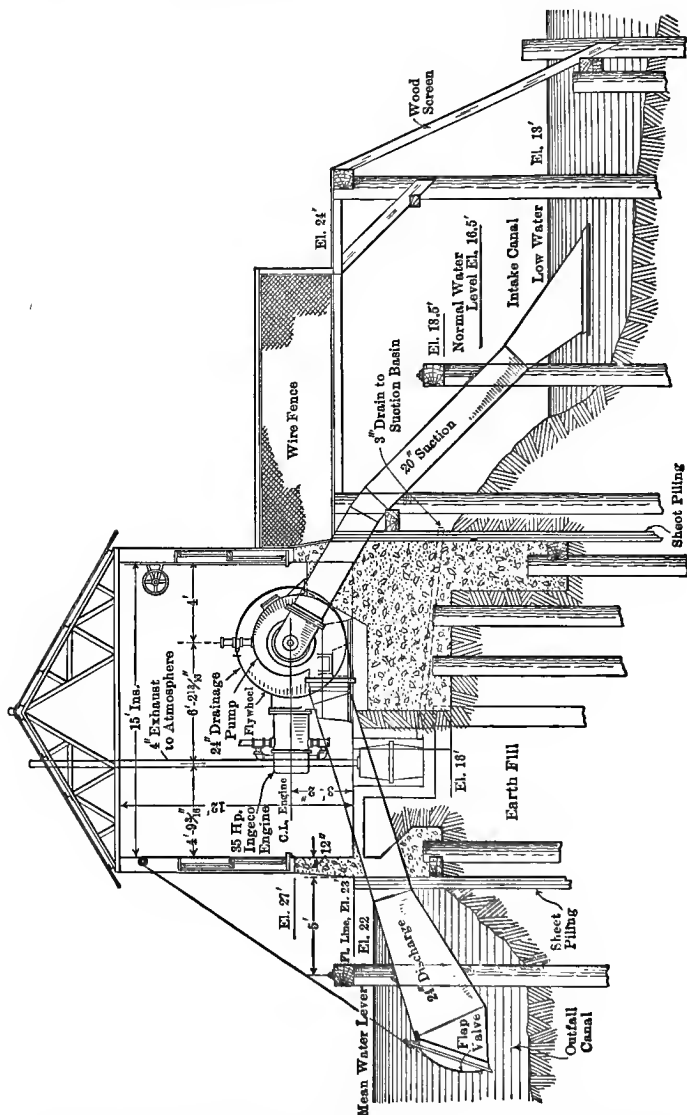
ELEVATION SHOWING ESSENTIAL PARTS OF A DRAINAGE PUMPING PLANT.
